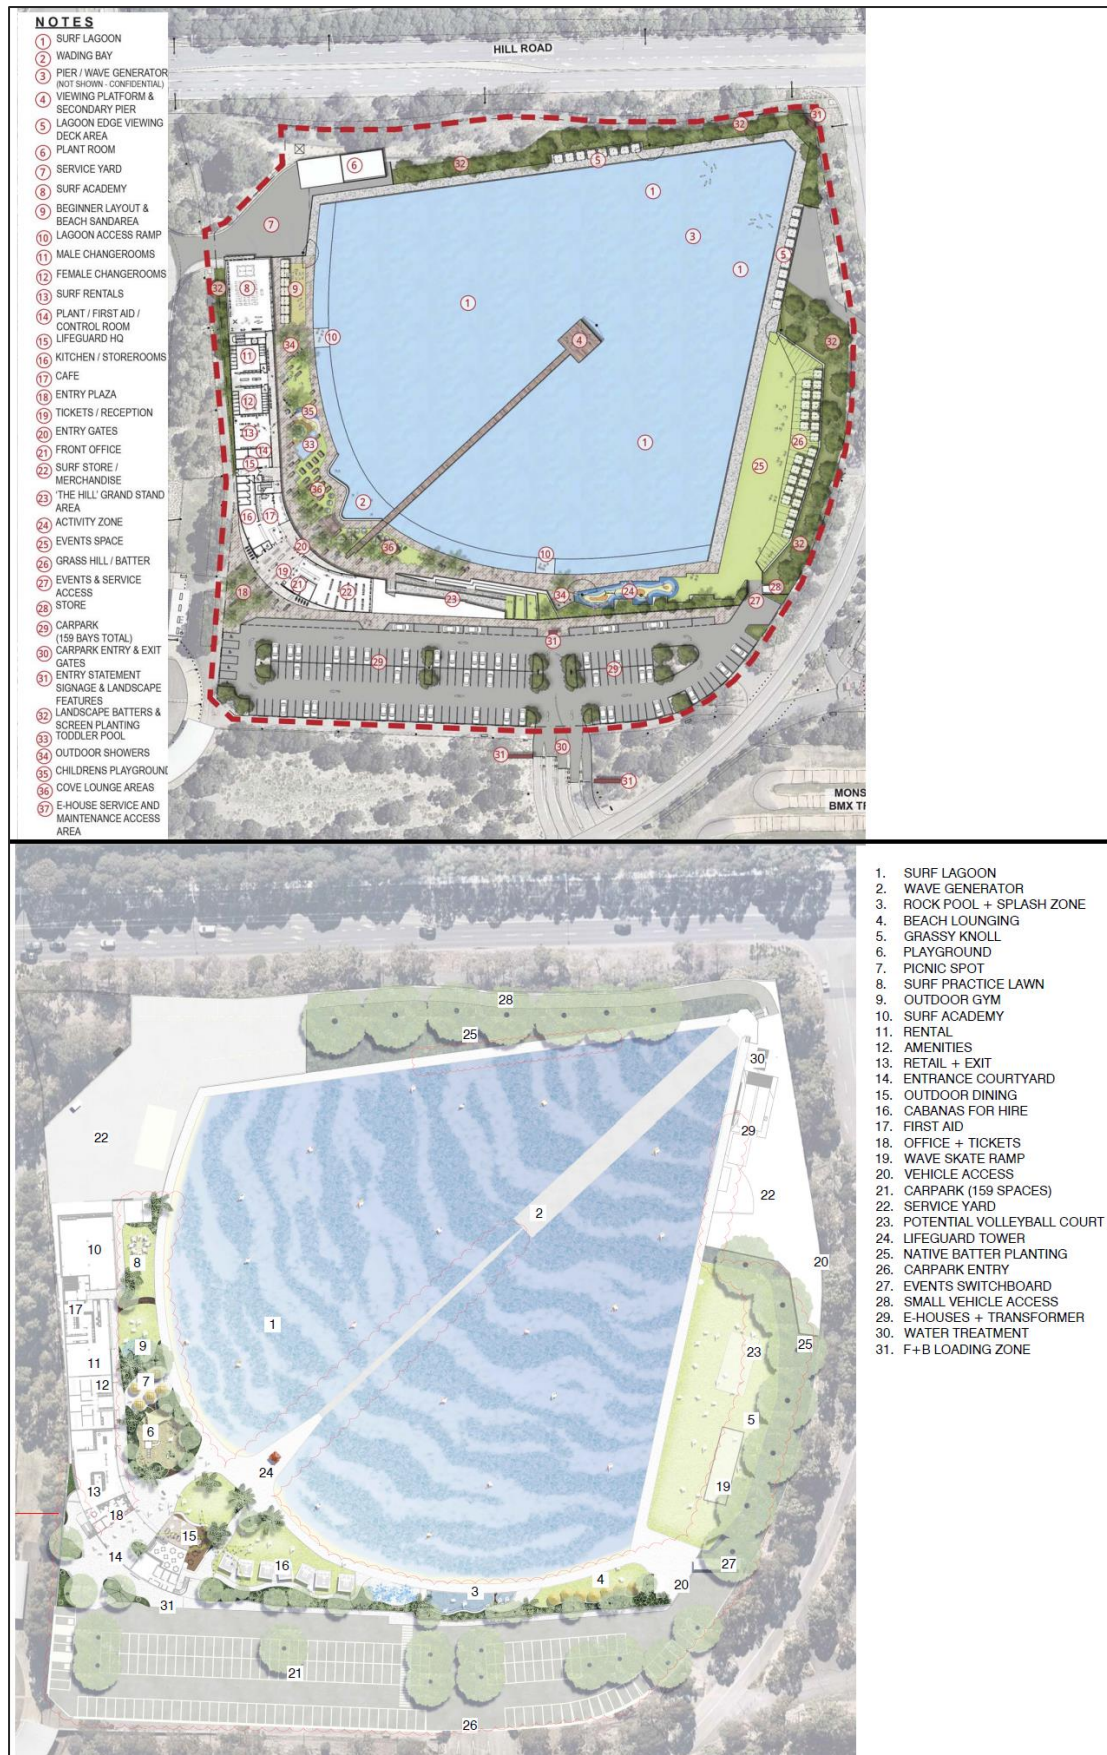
| The approved landscape plan (top) and proposed (bottom) (base source: RTS)
